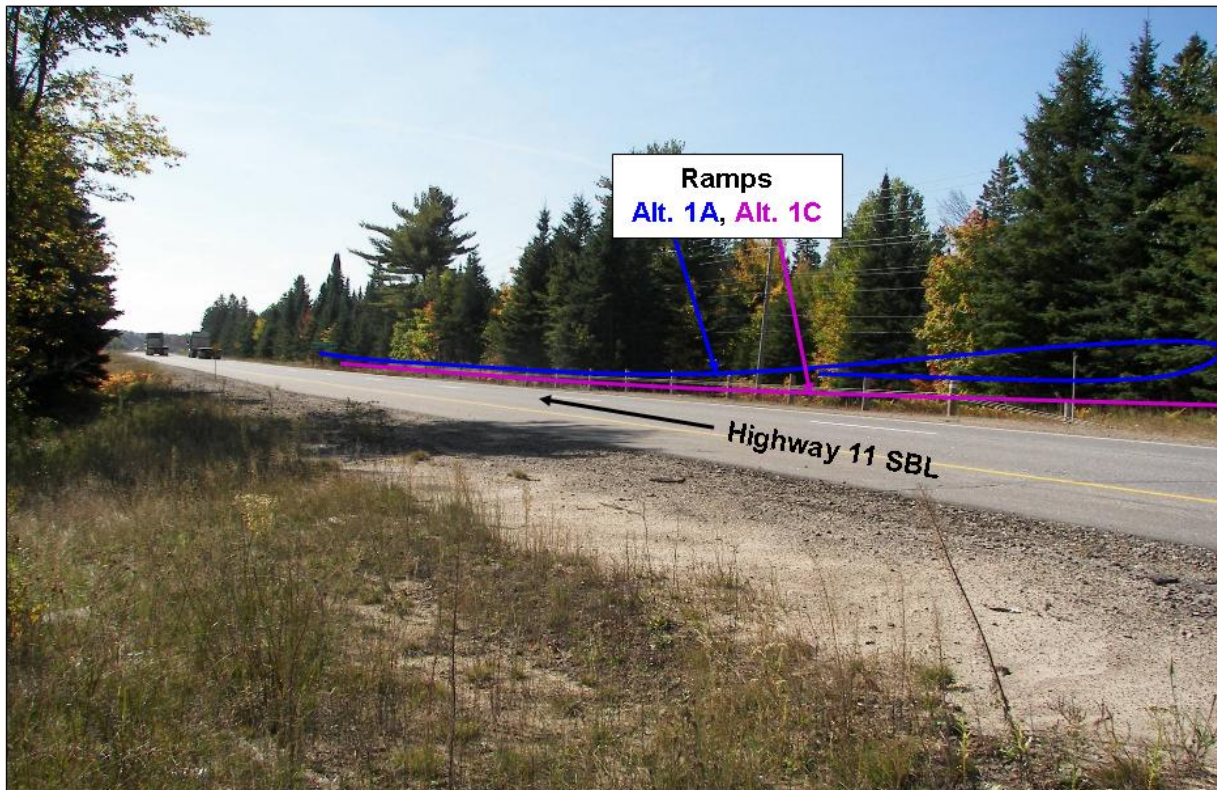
VIEW: Looking northwesterly from east shoulder of Highway 11 SBL at west abutment option of I/C underpass (Sta. 20+200). (Sept. 26, 2008)
